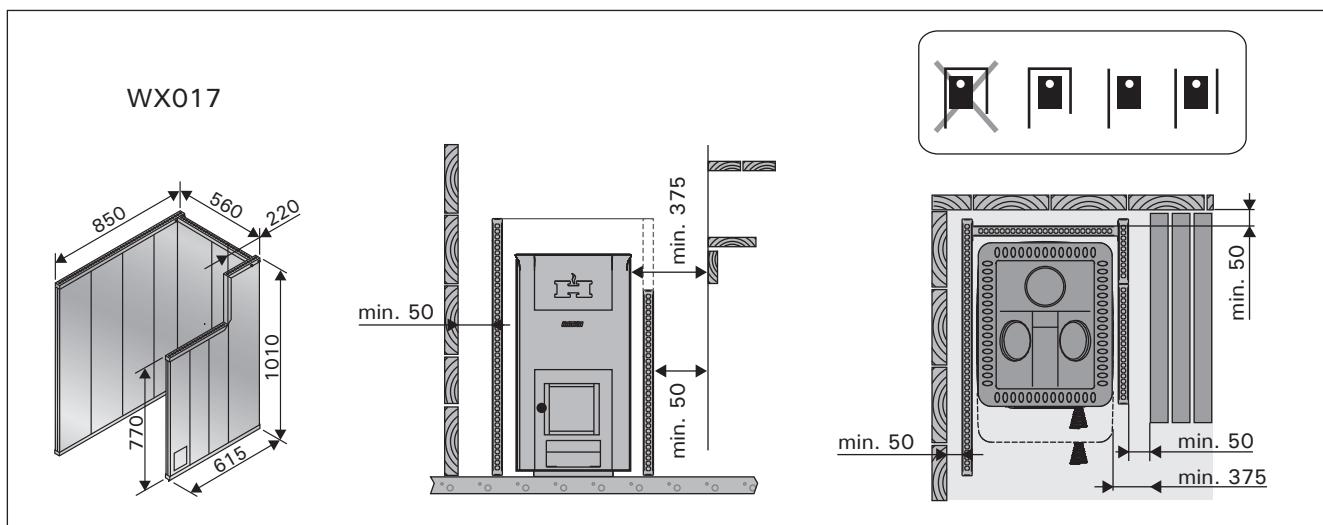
Safety distances with protective sheaths (all dimensions in millimeters)
